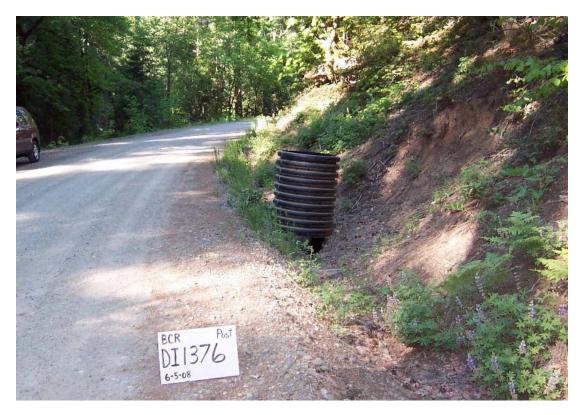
(above). Site 1376. Looking from the other side of the ditch from Photo 5, Photo 8 (below) showing drop inlet and outsloped road segment.
